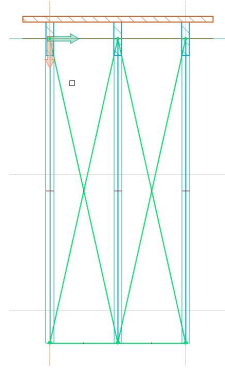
Illustration of the bridge cross-section at the central compression struts.
